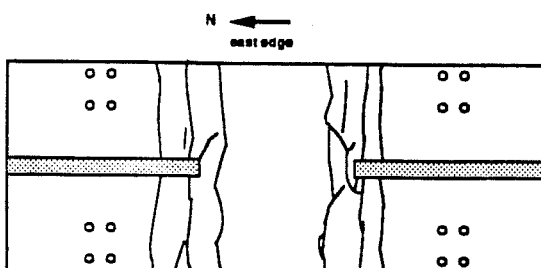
Sp. 2a: Progression of Cracking of Top Face of Second Floor Slab at End of Test
